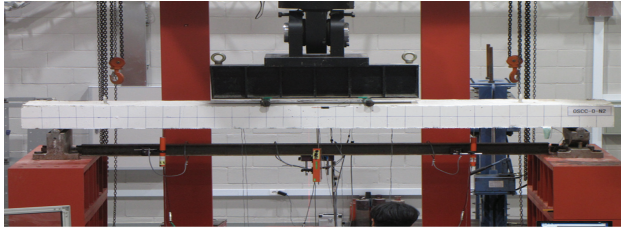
Test Set-up Example : Specimen(L2-B100)
